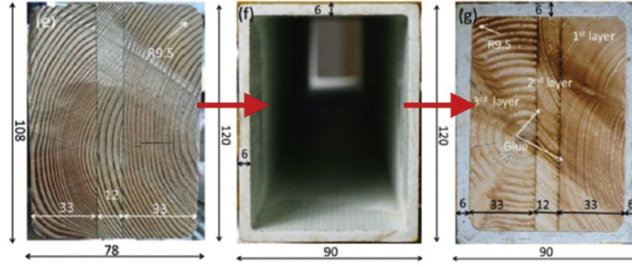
Pultruded FRP beam with wooden sandwich core [34].
